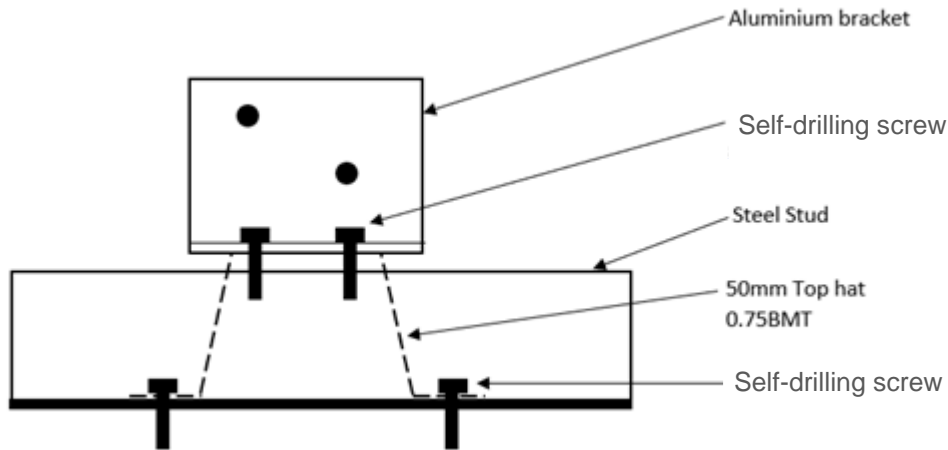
Alternative fixing detail for steel framed systems – aluminium clip fixed to the steel track/floor joist via steel top hat
